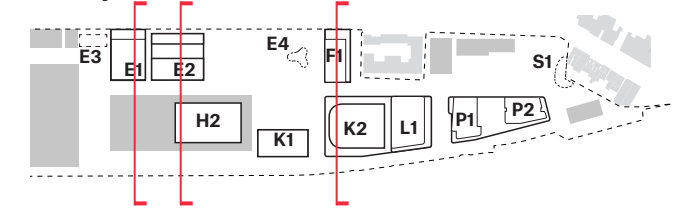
Building envelopes section diagram through E1 & Paint Shop
